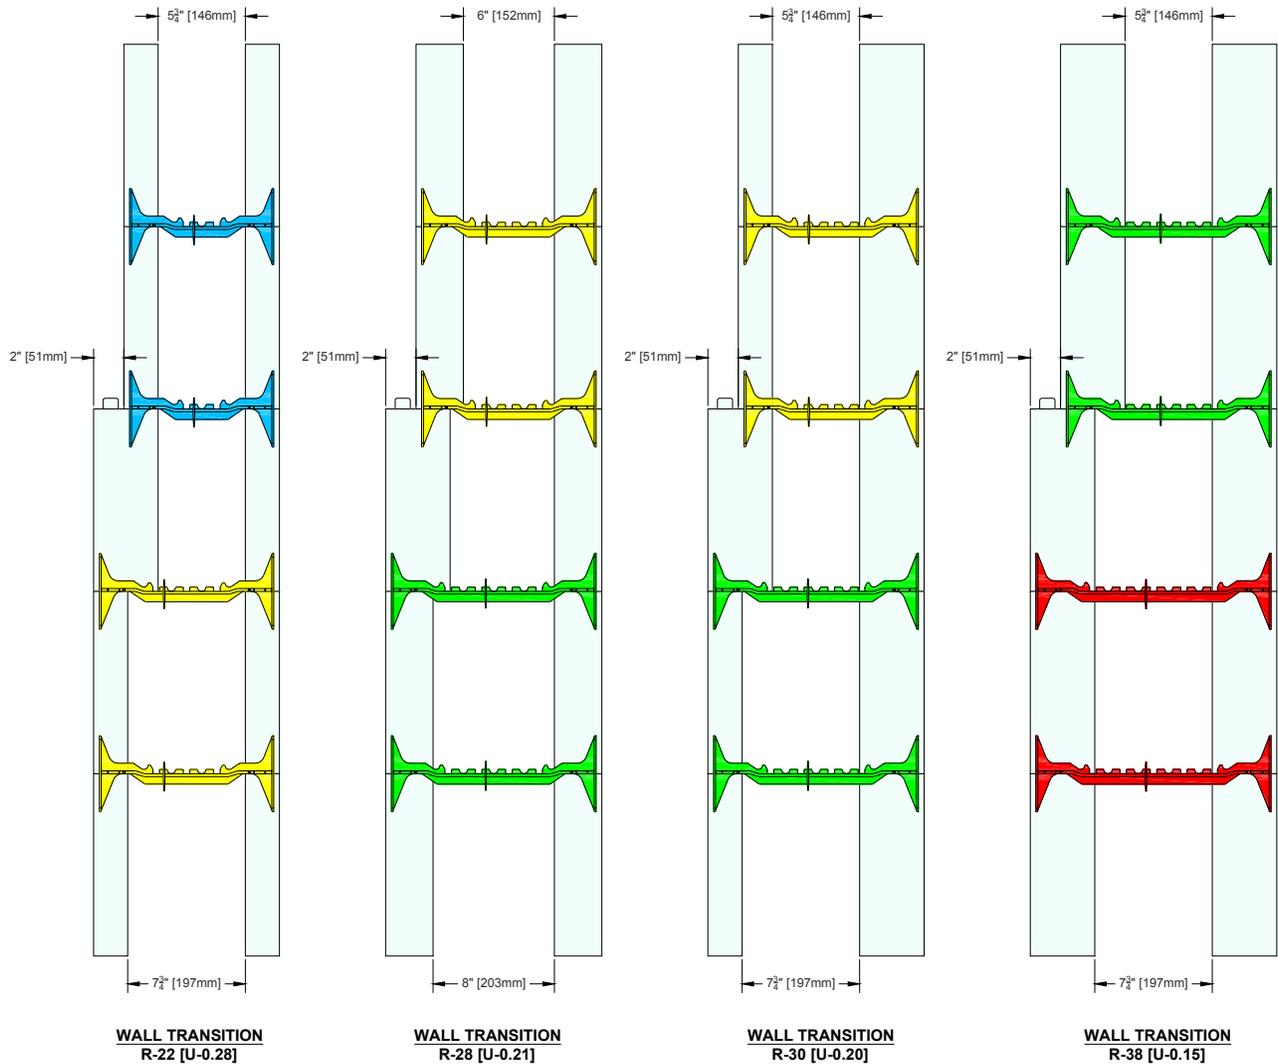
Wall Width Transition using Quad-Lock Plus Panels
